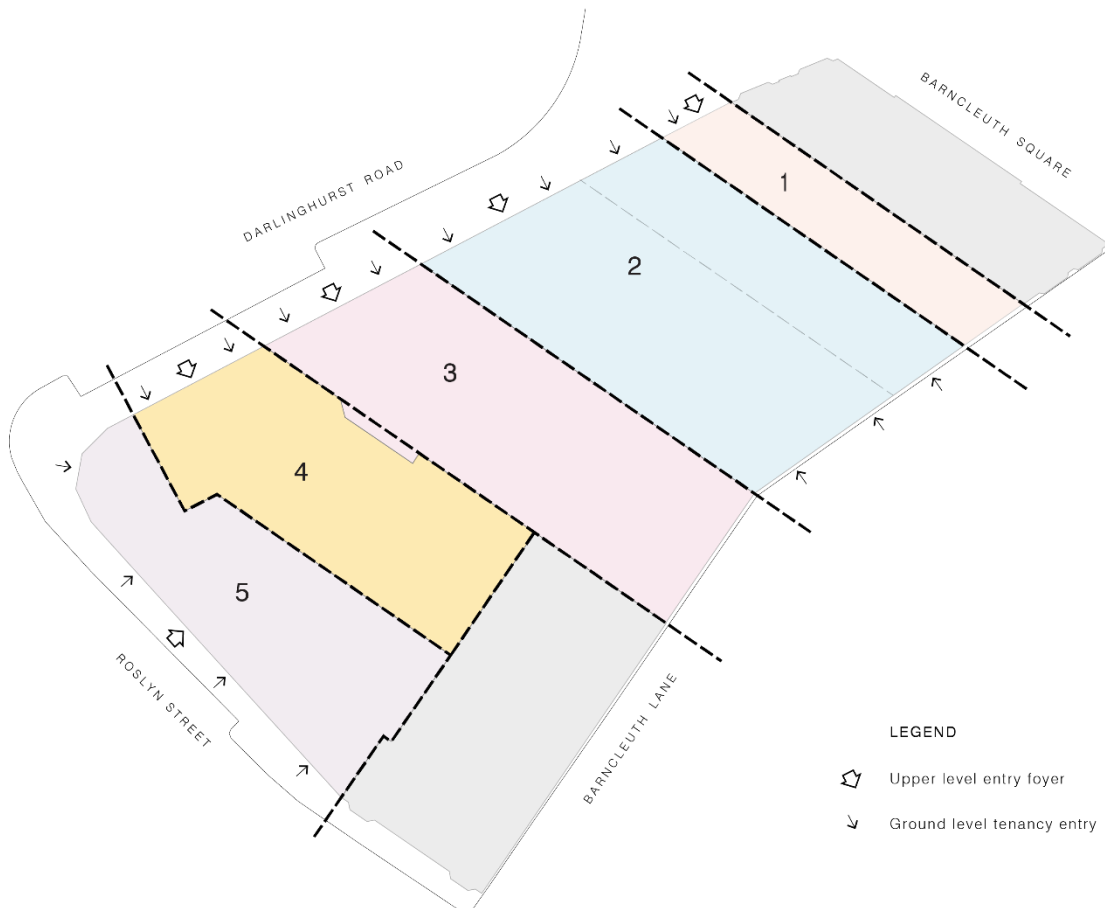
The block is to be composed of 5 distinct buildings, each with their own street-level entry, core, architectural language and expression
